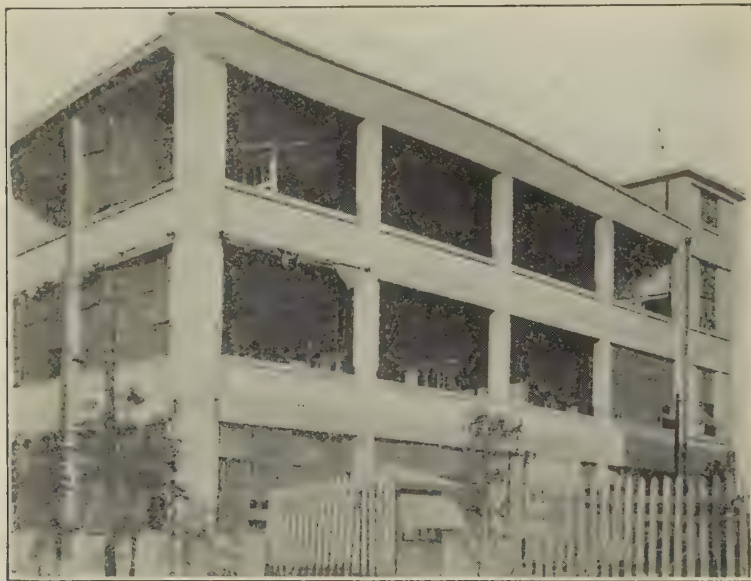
BUILDING NO. 18, INDUSTRIAL PLANT AT KAWASAKI, BETWEEN
